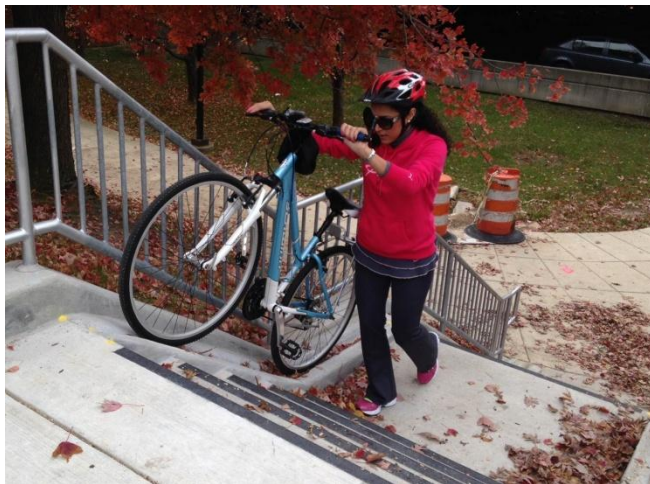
Example of Bike Ramp – Bike Track (Pinterest photo)
